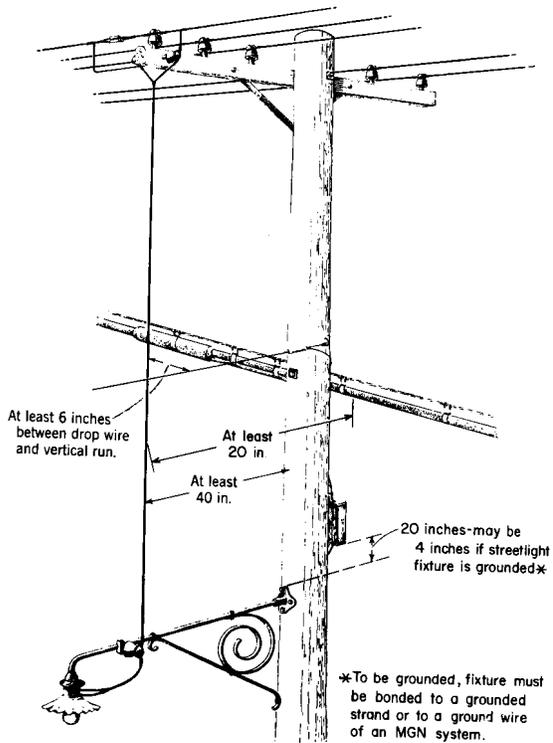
Clearance of Cable From Streetlight Fixture Mounted Above Cable
